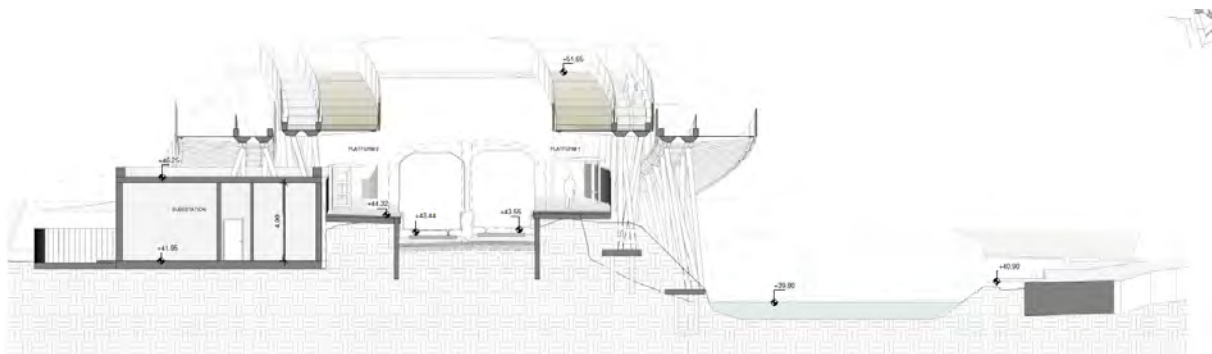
Cross section at Ashtown showing the northern ramp overhanging the Royal Canal
